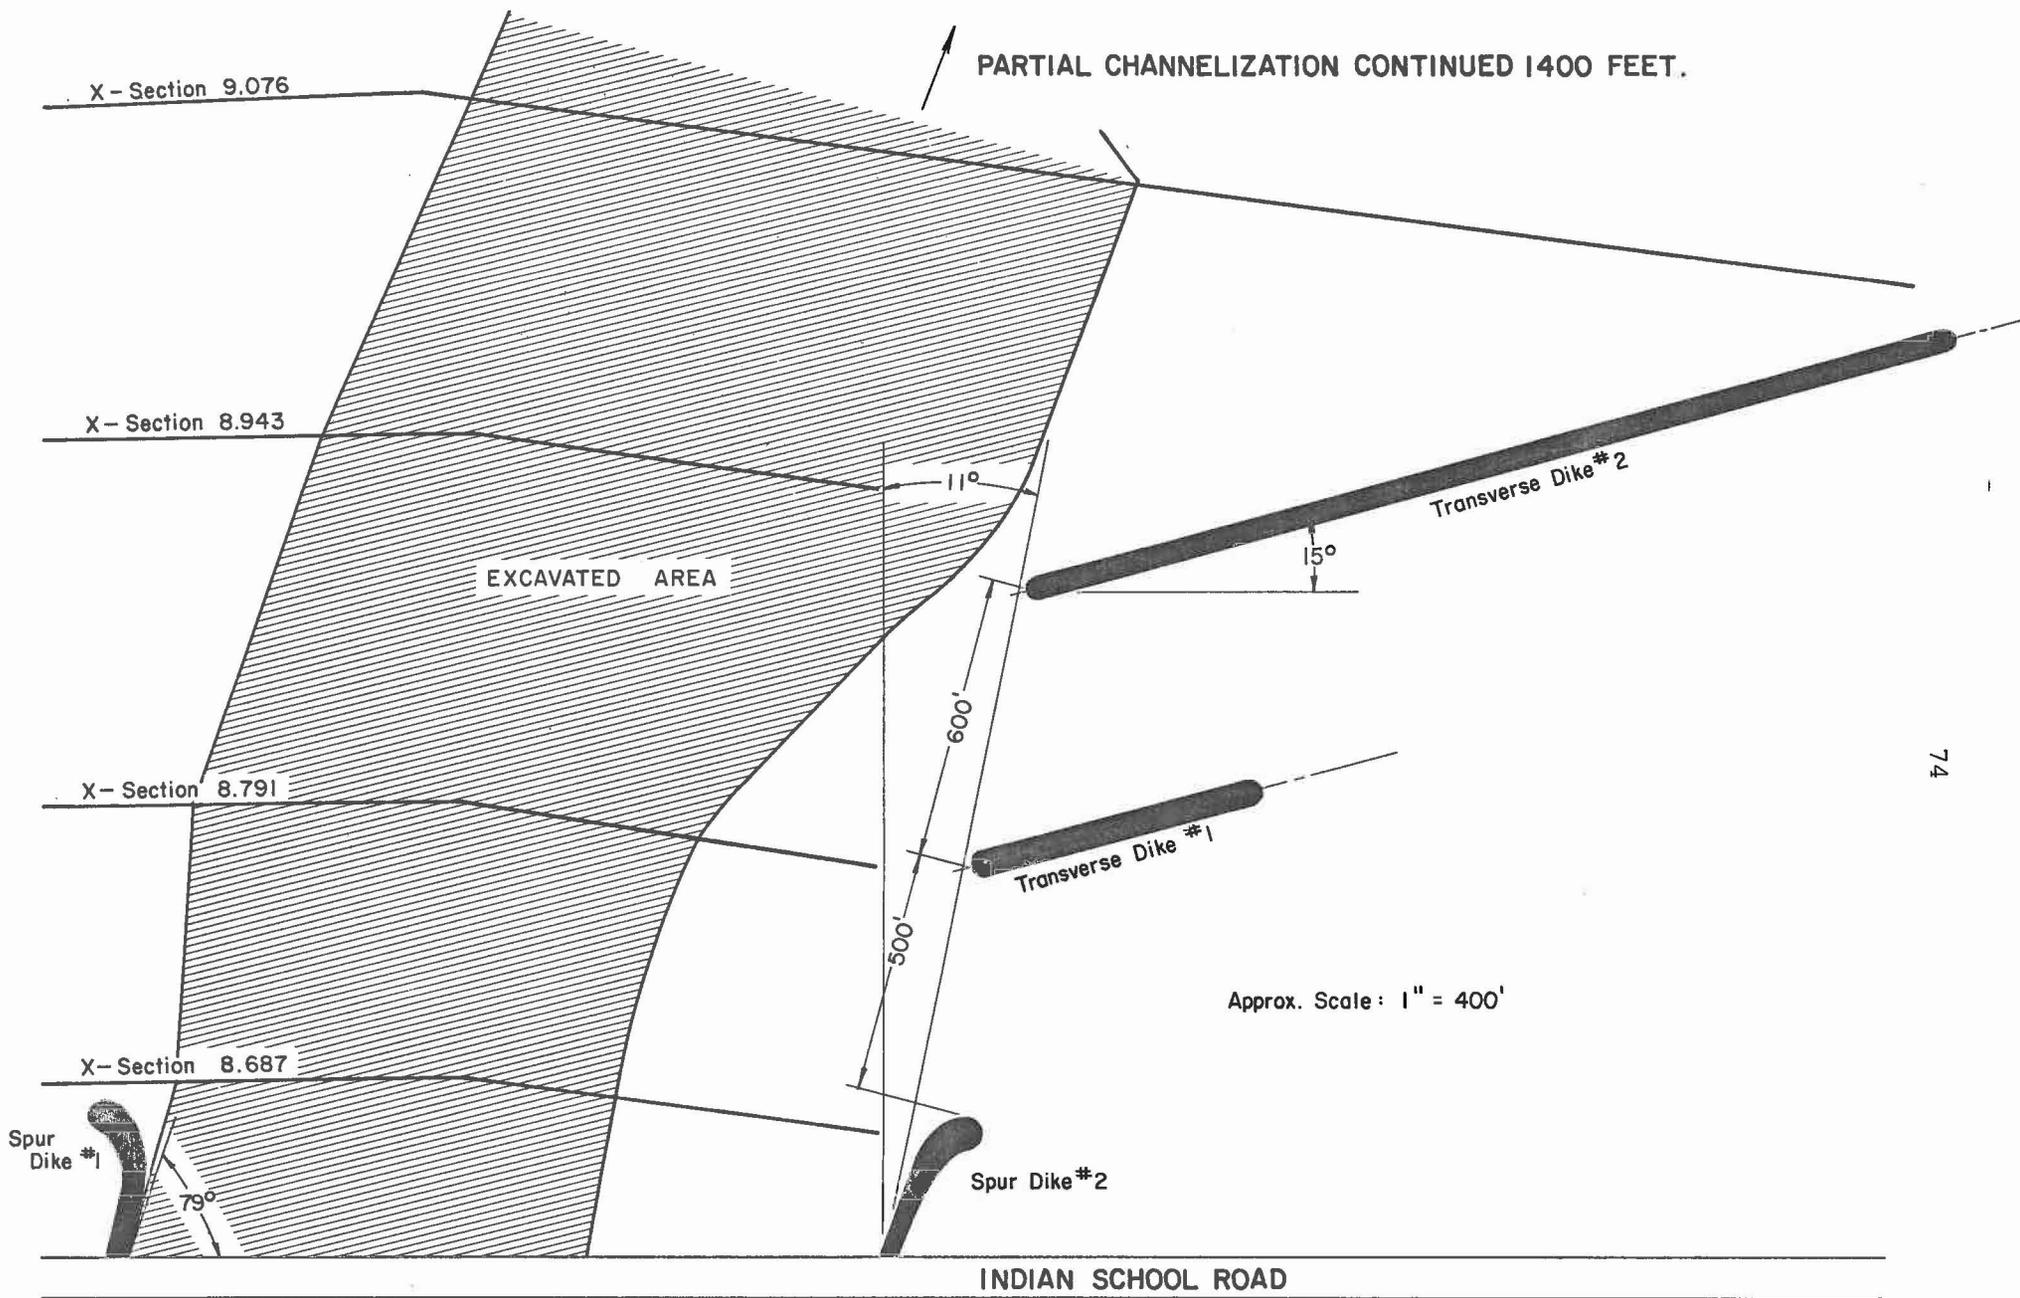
Location and orientation of spur dikes and transverse dikes.
